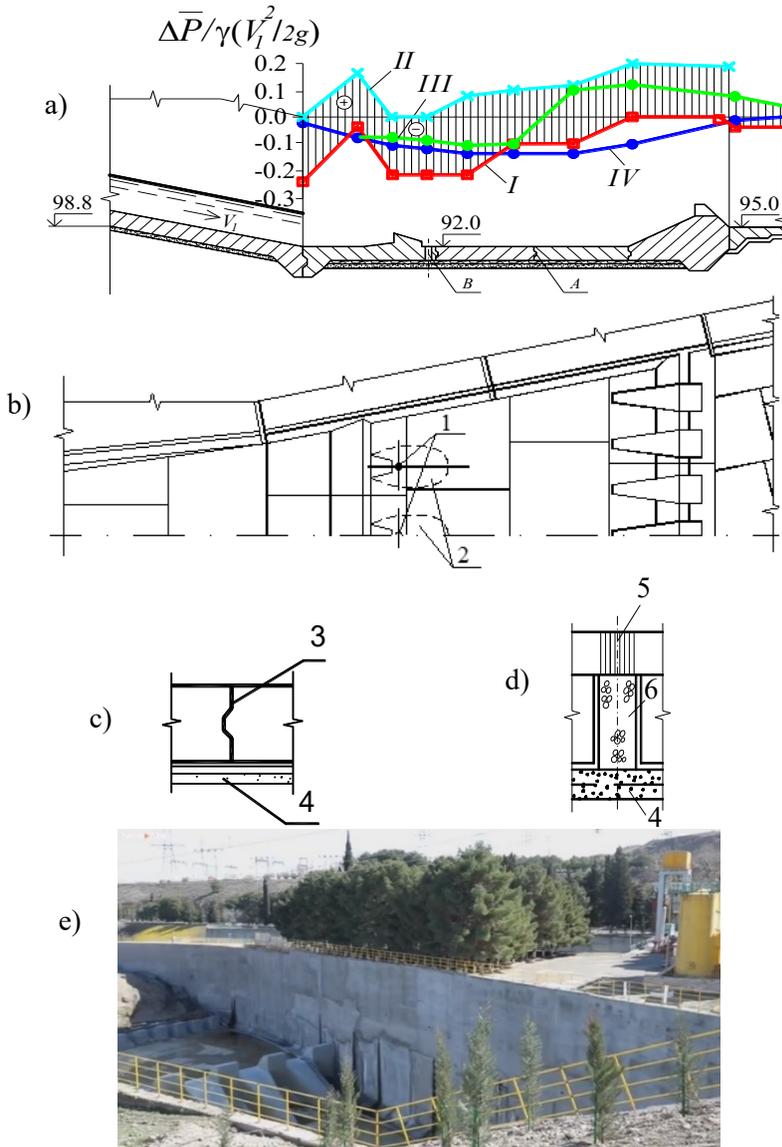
Scheme of quasi-static loading and the proposed structural elements of the fastening slabs of the water outlet section of the Shamkir hydroelectric complex:
